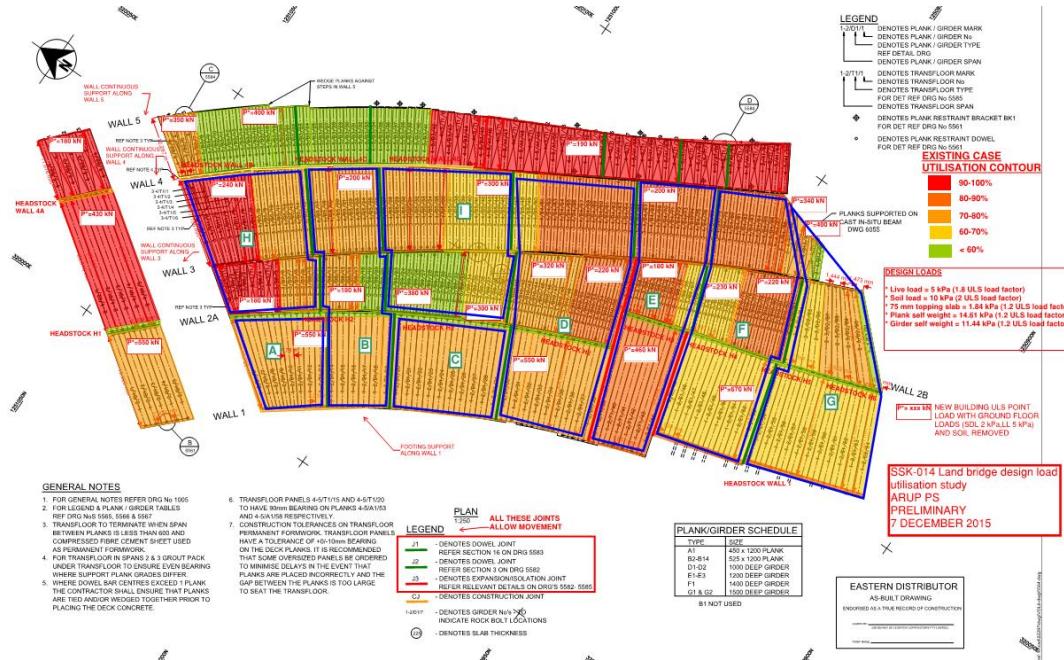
Structural utilisation of land bridge under original design loading (Arup sketch based on Maunsell McIntyre drawing N641/N/ST/5580 Rev AB0)
